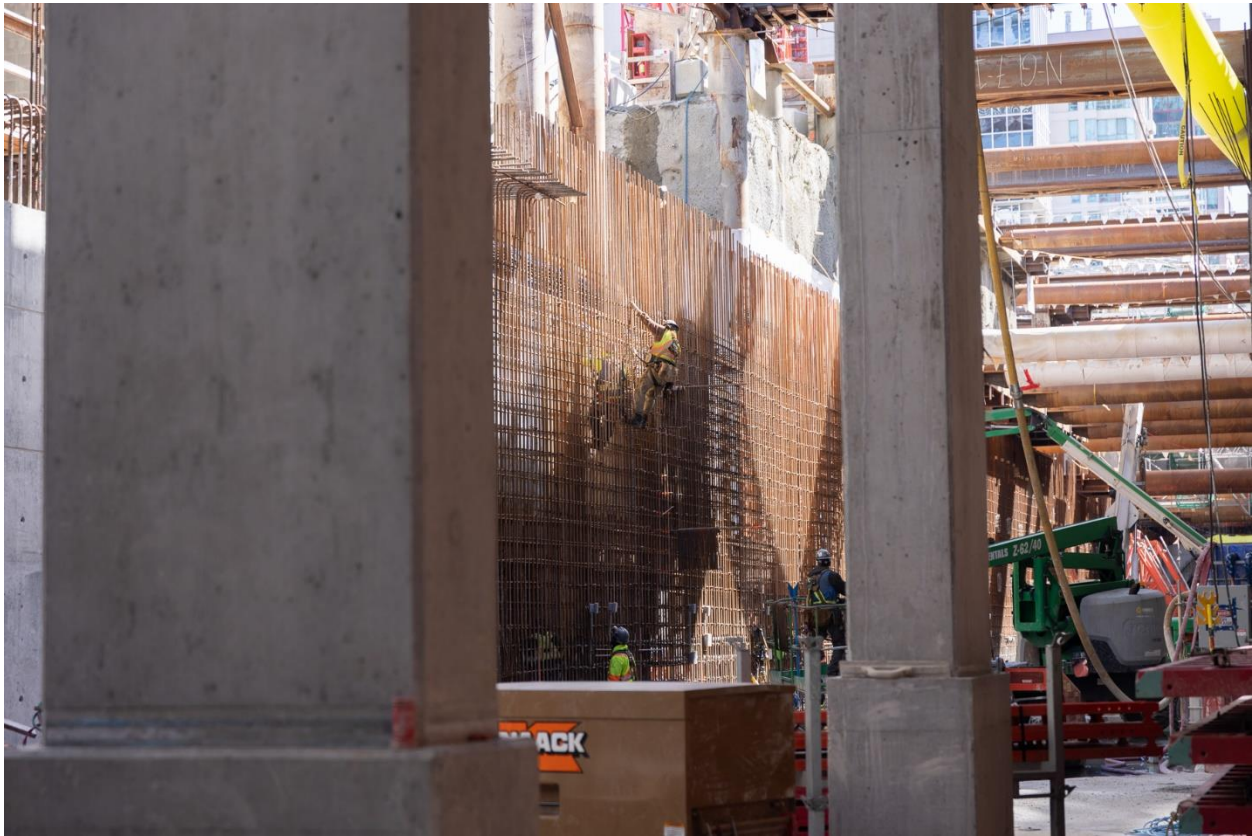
South Granville Station: Progressing with rebar and concrete pours for the station walls.
